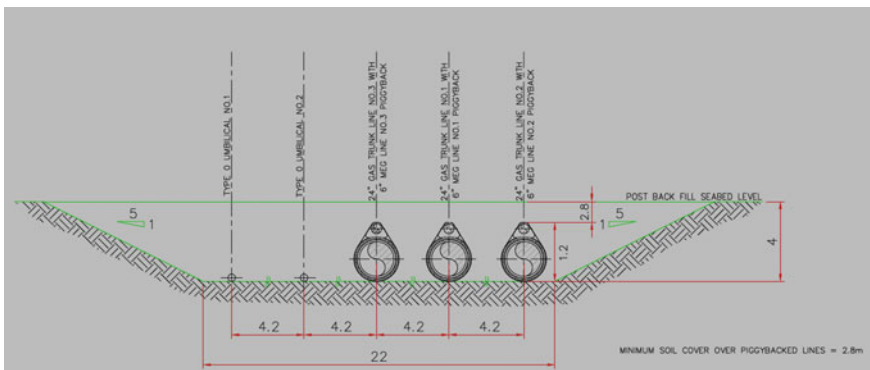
Typical submarine pipeline trenching detail of 24" existing pipelines
